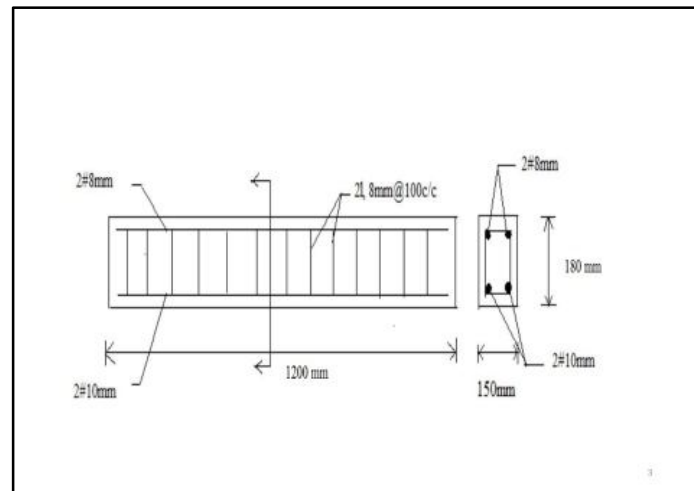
Reinforcement Details of Test Beam-1, 2, 3, 4
